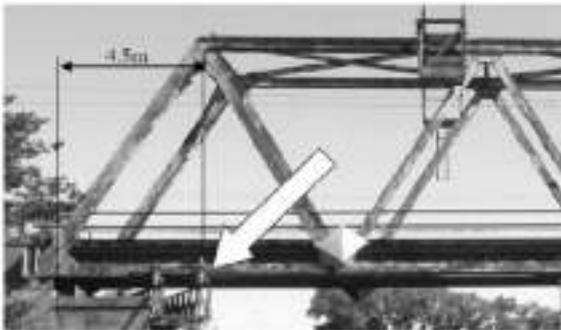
Location of measurement points on the main girders, at the whole length of the bridge
